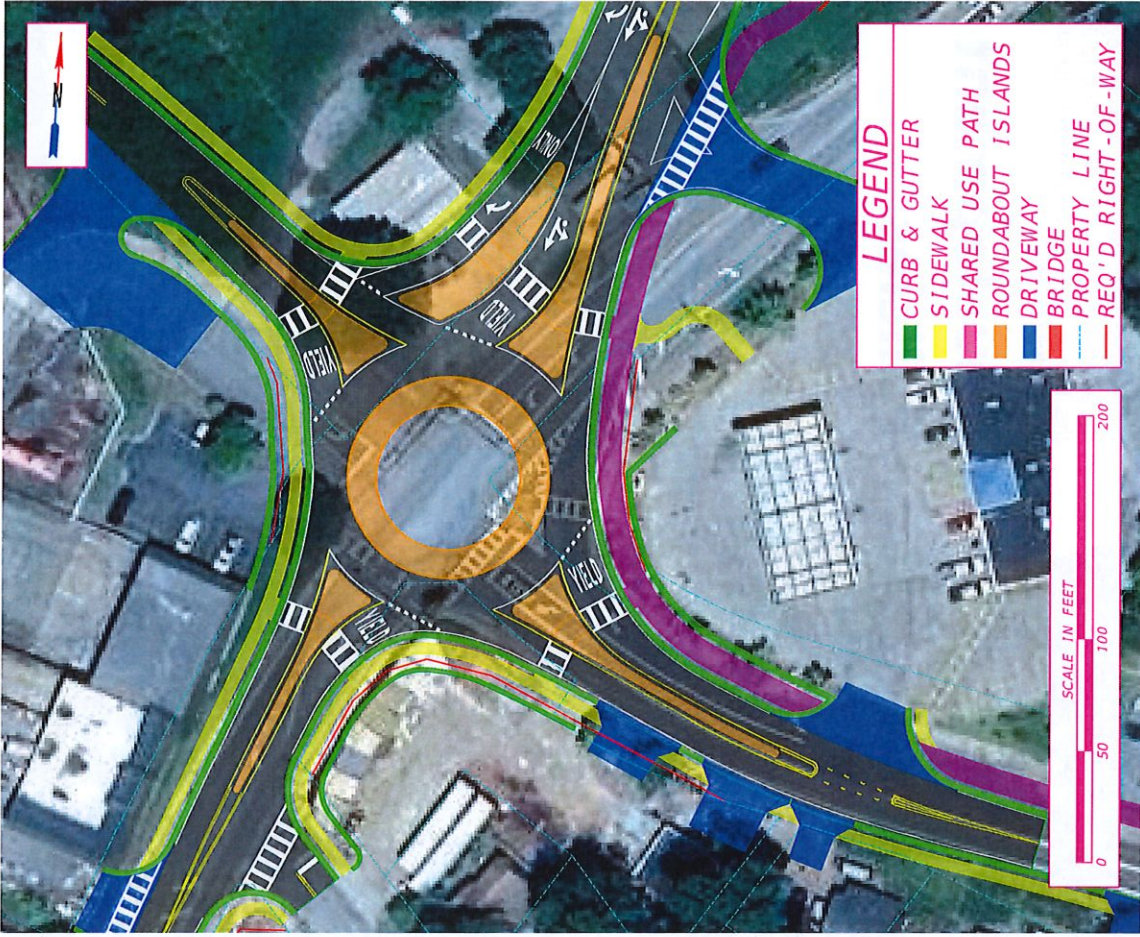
Roadway Concept - Hickory Flat Highway and Marietta Street Intersection
